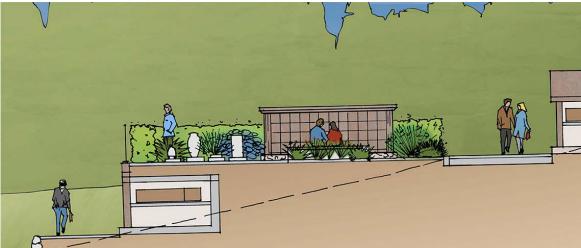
Section through Proposed Above-Ground Crypt and Cremation Niche Wall.
